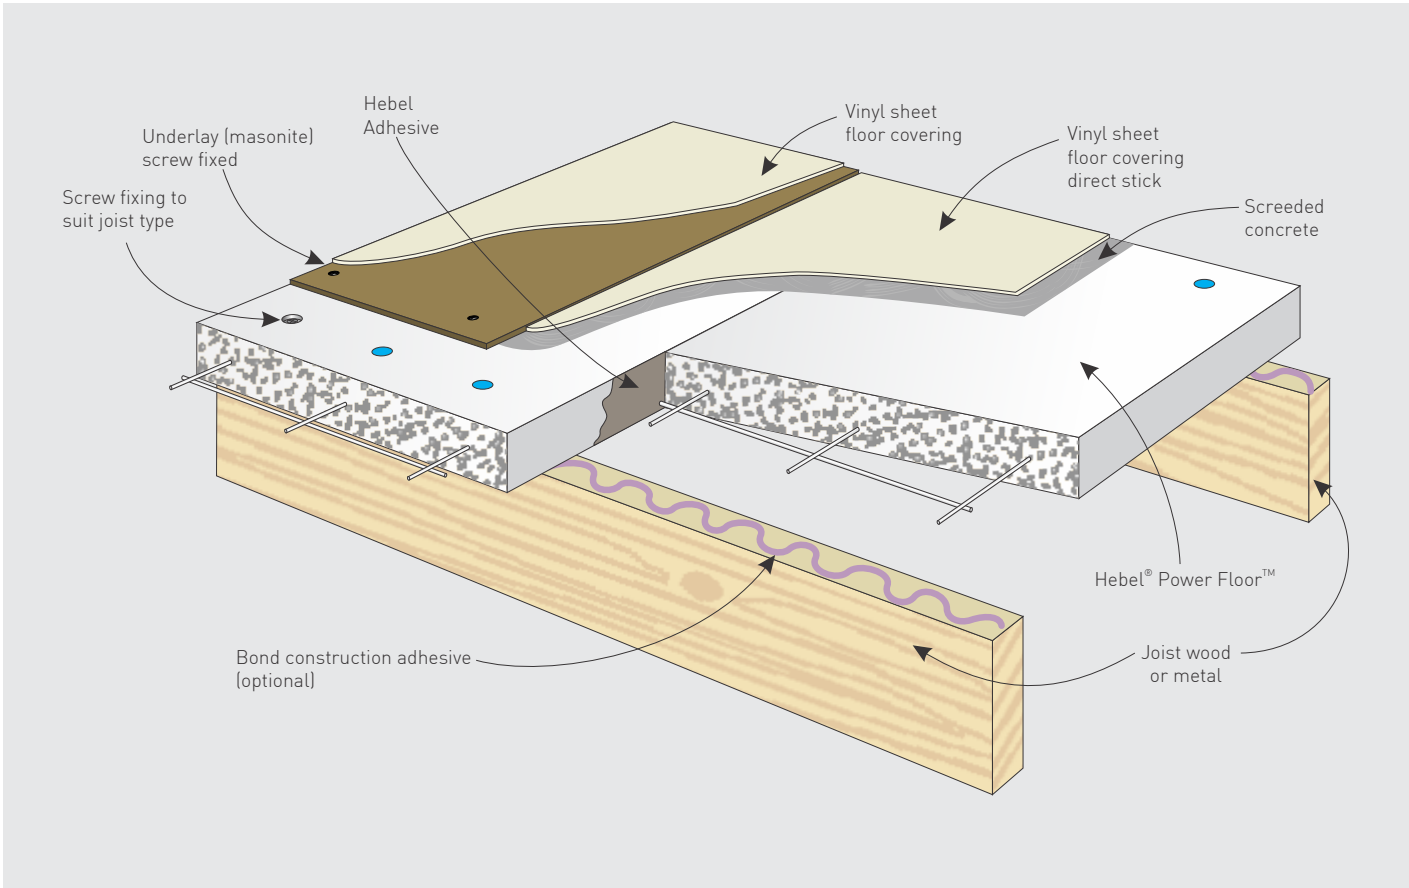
Hebel® Power Floor™ System Vinyl Sheet with Masonite.
